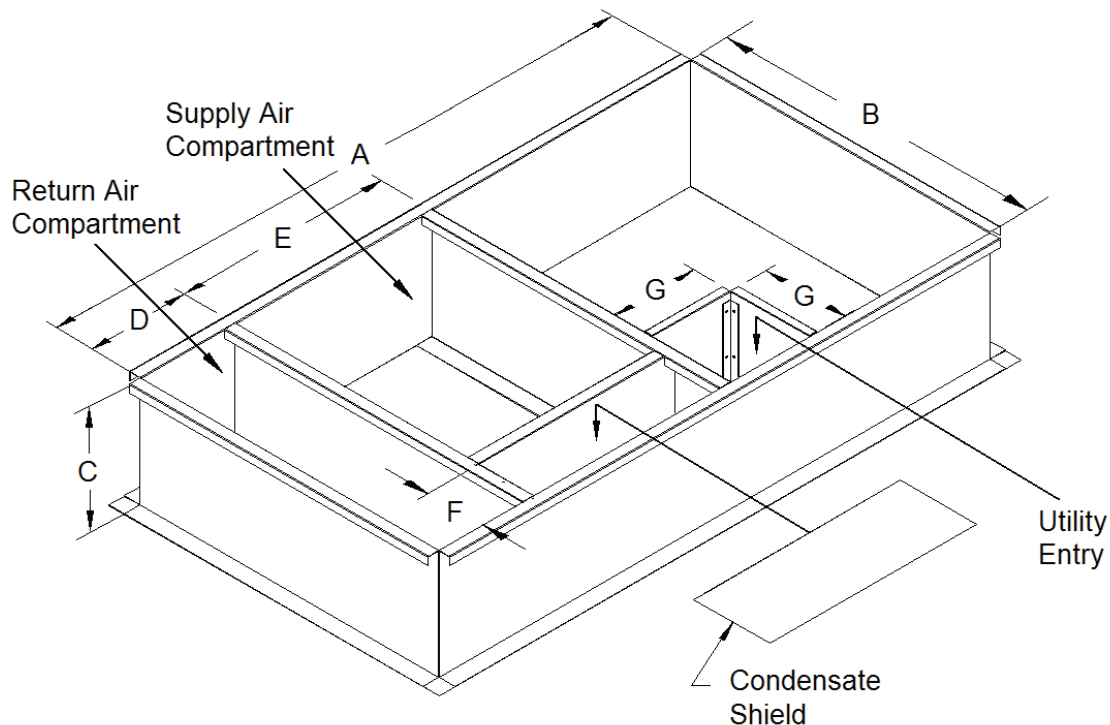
HB Series Packaged DX Unit Acoustical Solid Bottom Curb
